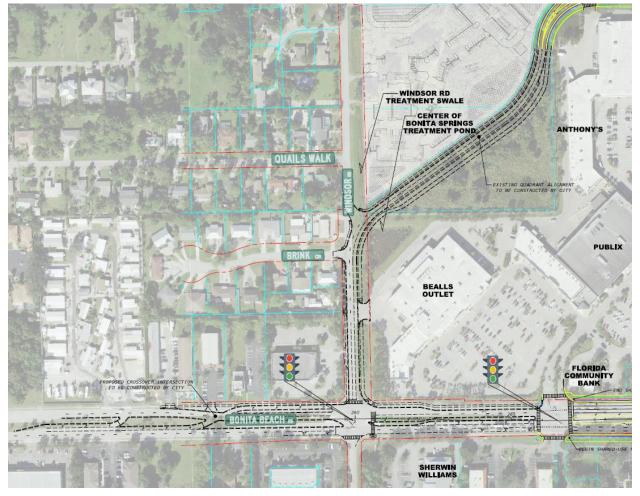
NORTHWEST QUADRANT ROADWAY – PROPOSED CITY ALIGNMENTS
